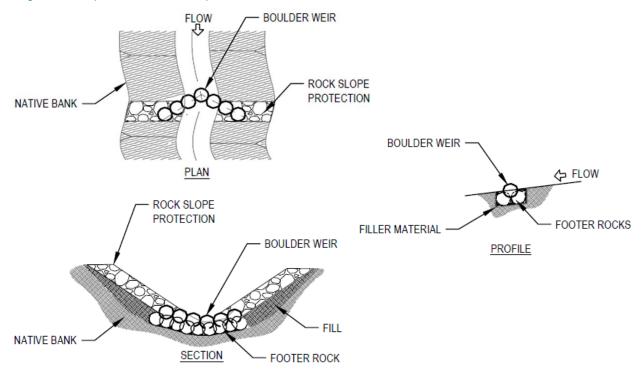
Conceptual Plan, Section and Profile of Boulder Weirs.
